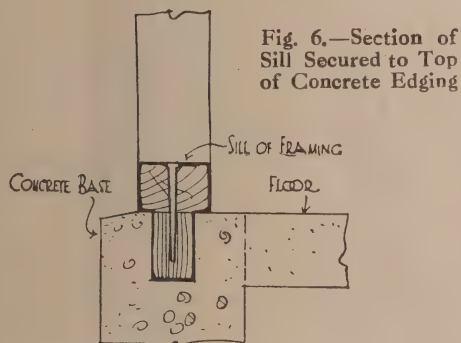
Section of Sill Secured to Top of Concrete Edging
